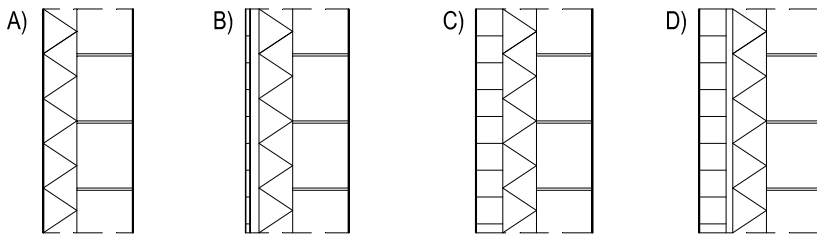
Examples of multi-layered external wall constructions (Source: own elaboration)
